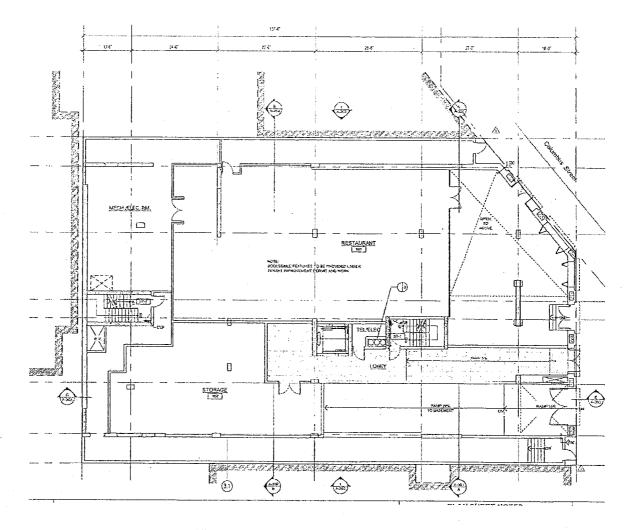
PROPOSED 1731 POWELL ST GROUND FLOOR PLAN Source: SWS 1/7/13
